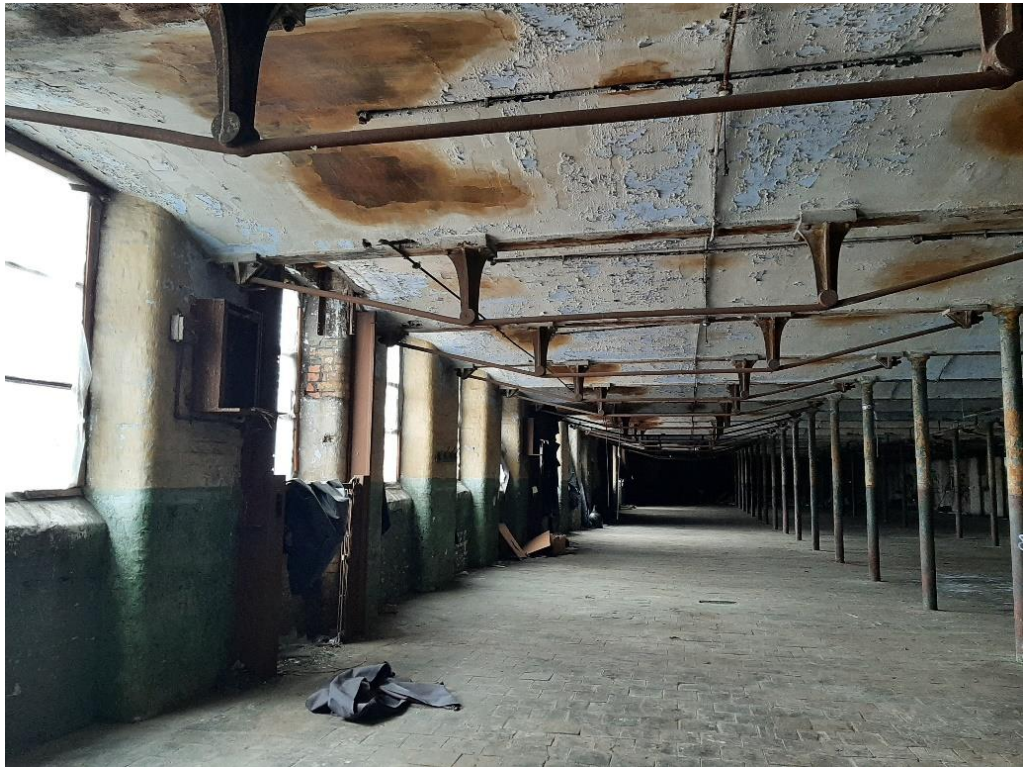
Masonry Jack Arch Floor Slabs on Cast Iron Frame
